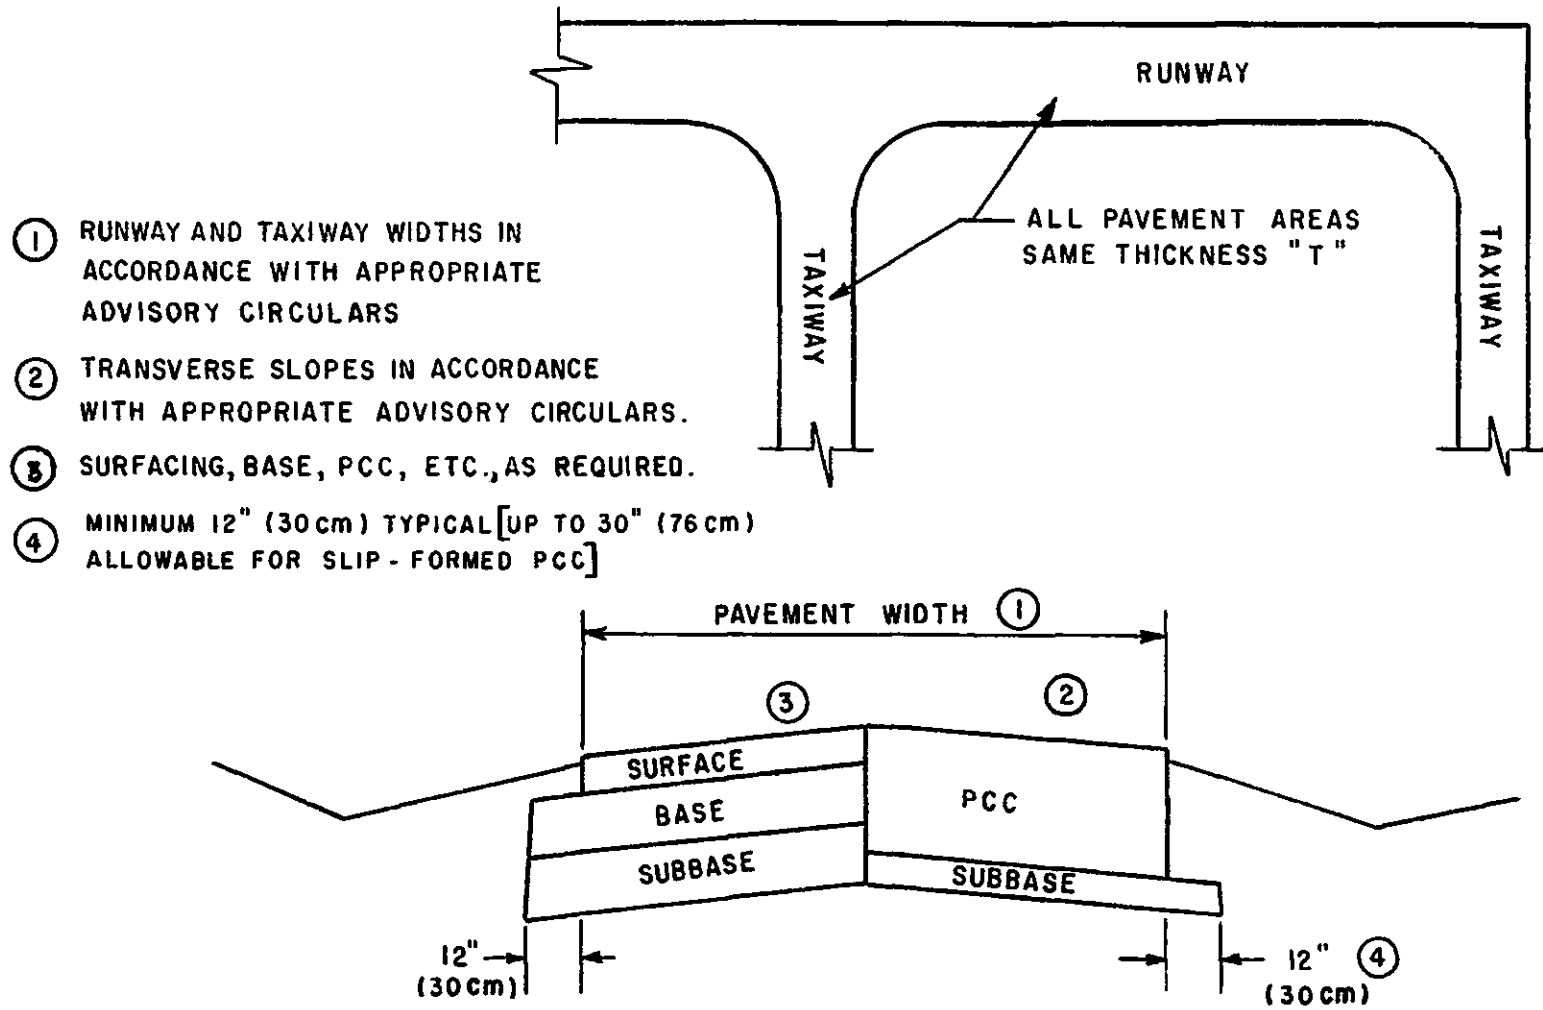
TYPICAL SECTIONS FOR LIGHT AIRCRAFT PAVEMENTS
